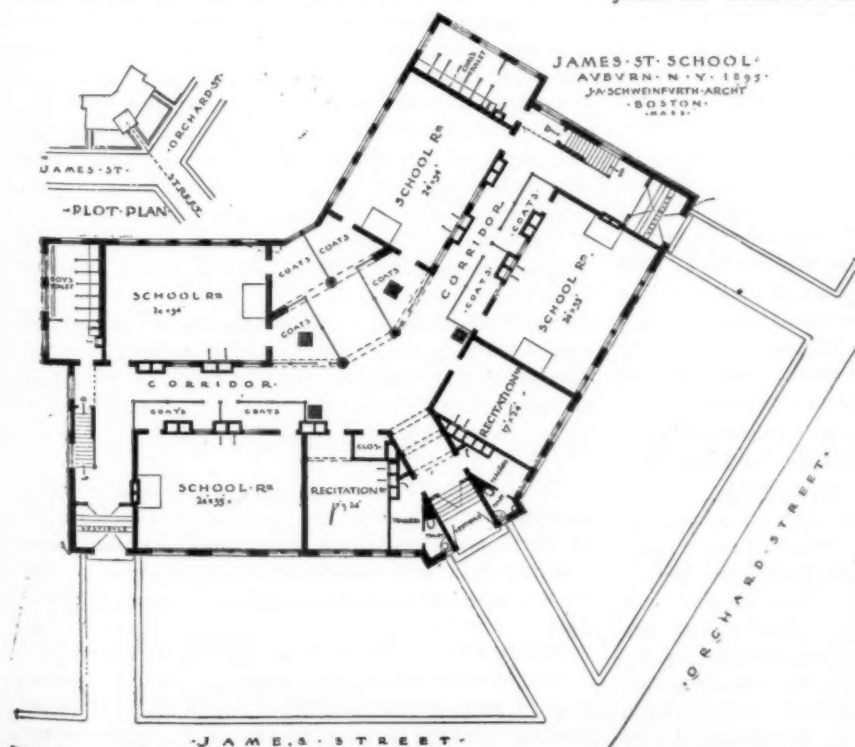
FIG. III.—FLOOR PLAN JAMES STREET SCHOOL AUBURN, N. Y.
